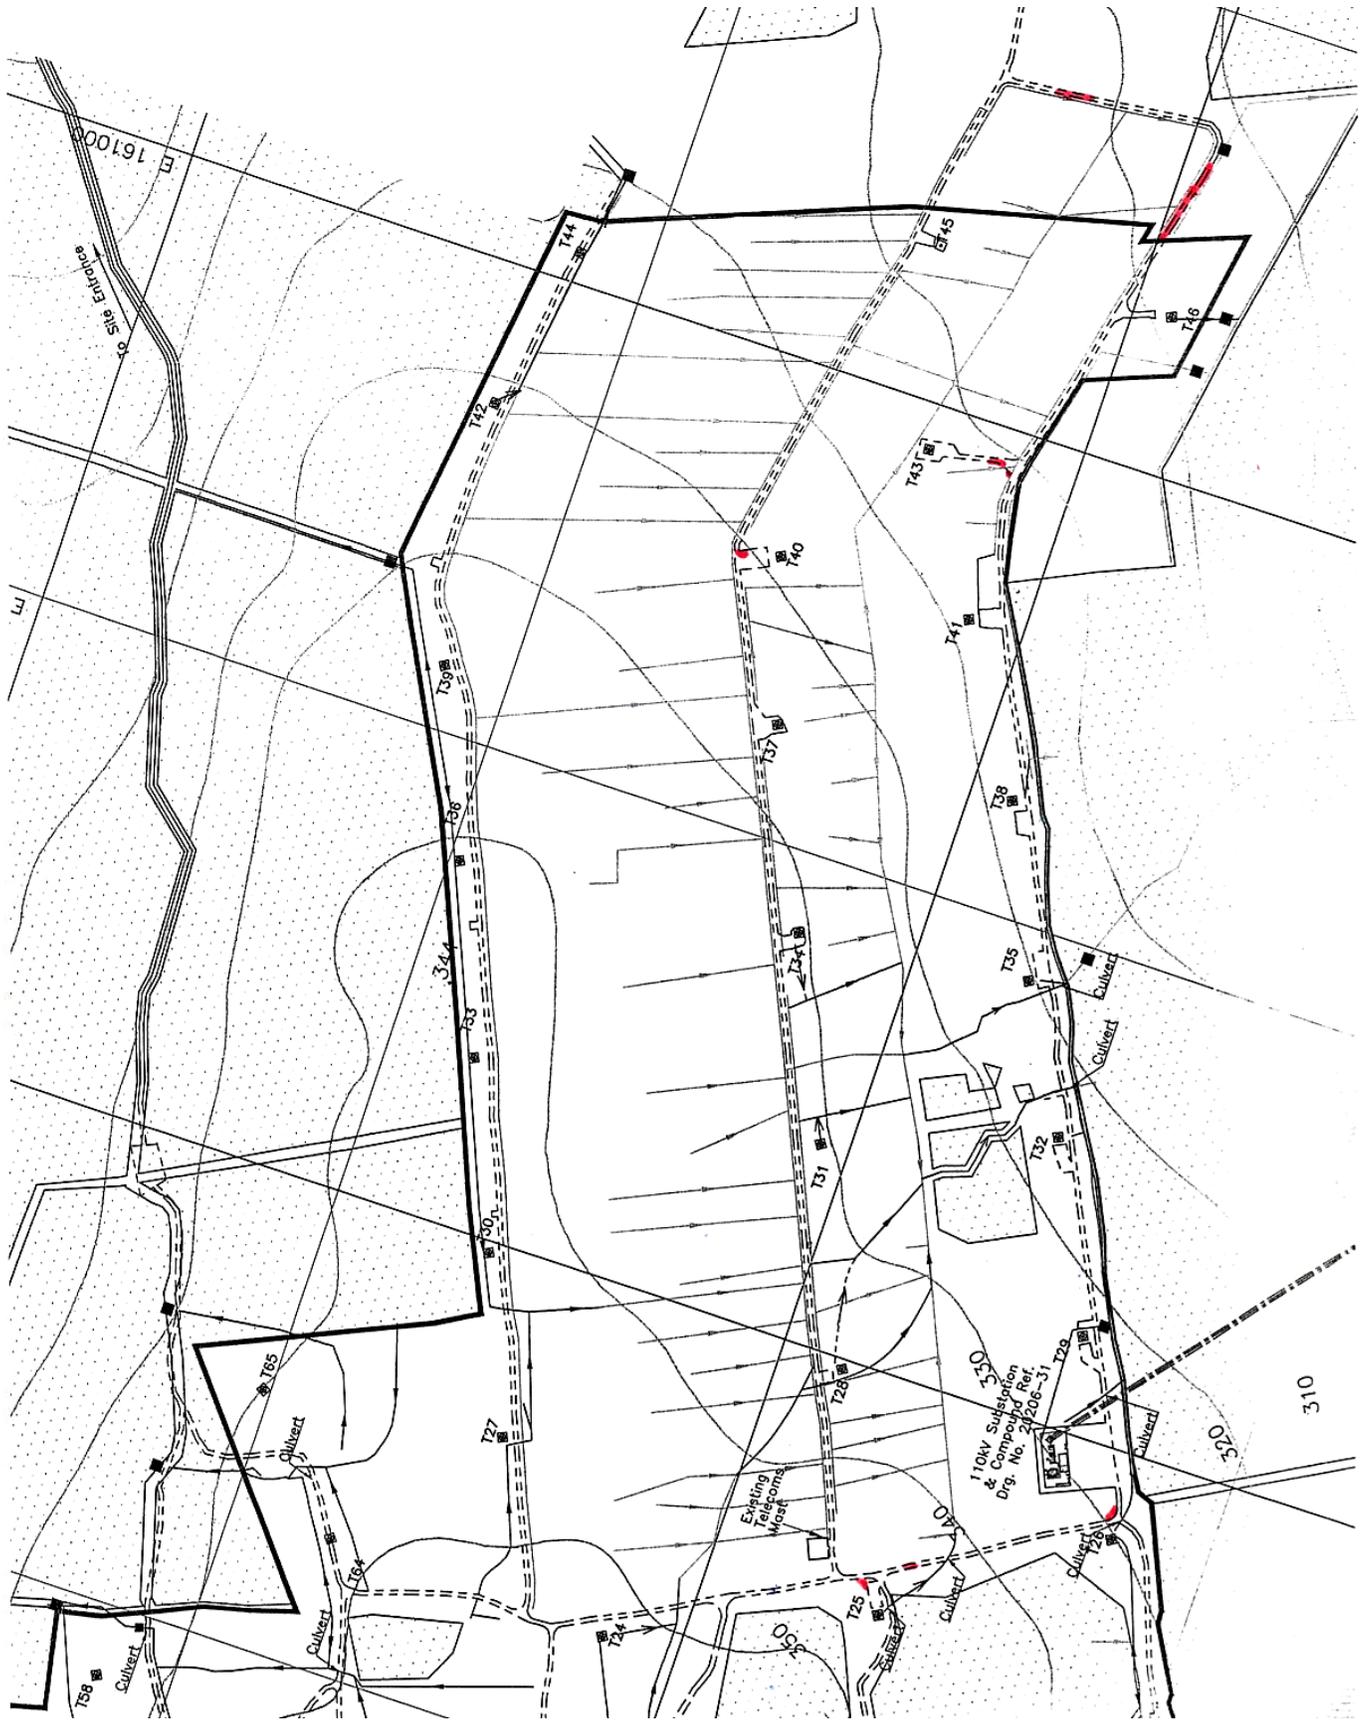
Sections of floating road classified as poor on east side of site (marked in red)
